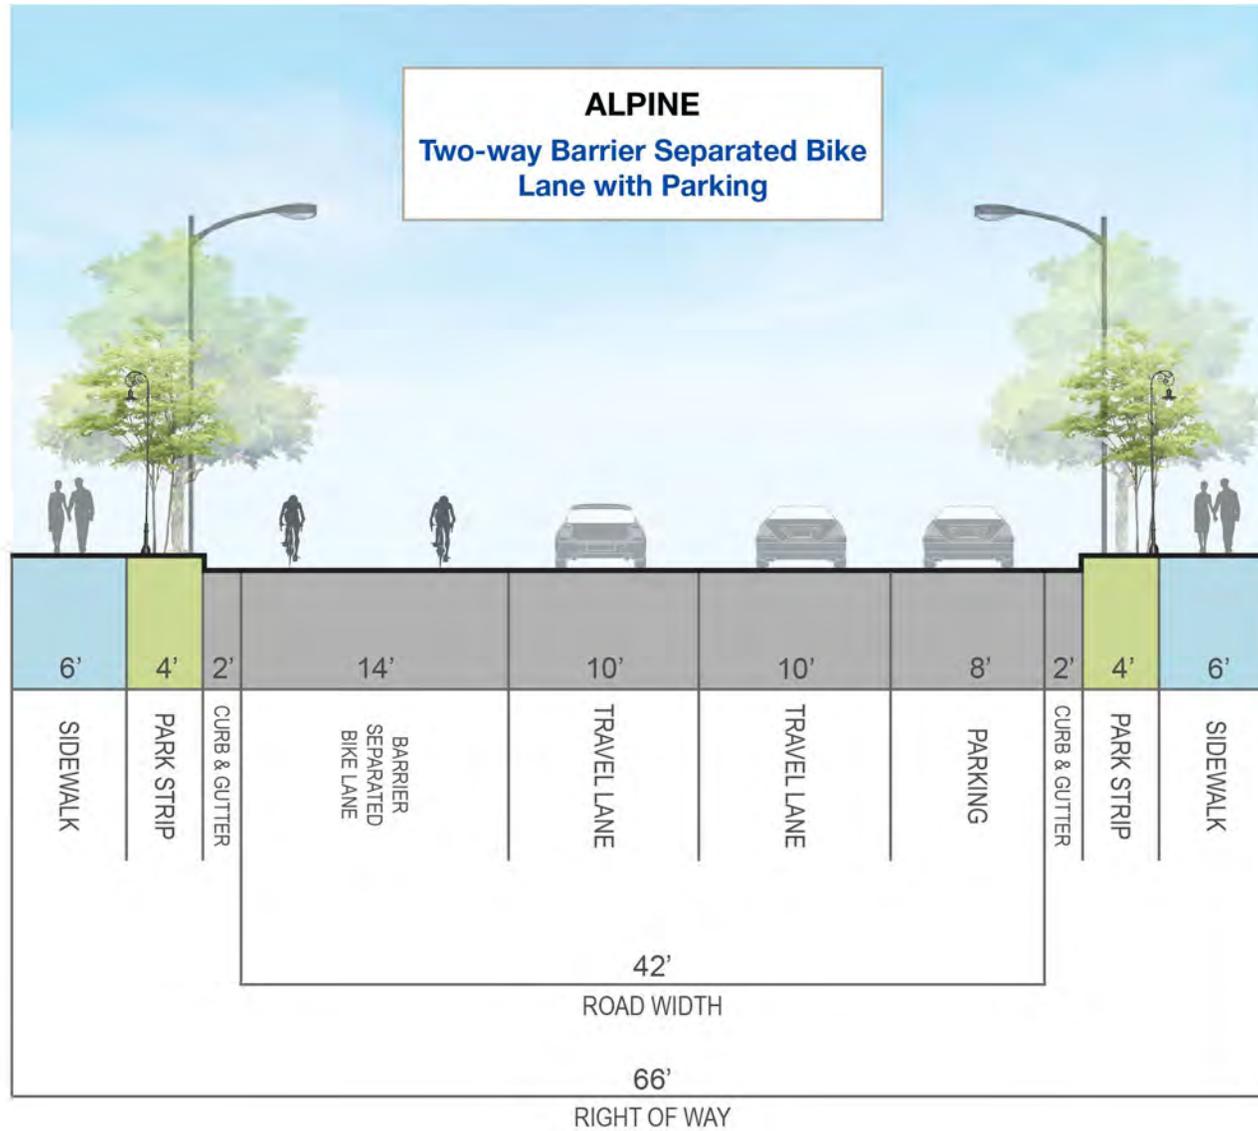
Two-way Barrier Separated Bike Lane with Parking
